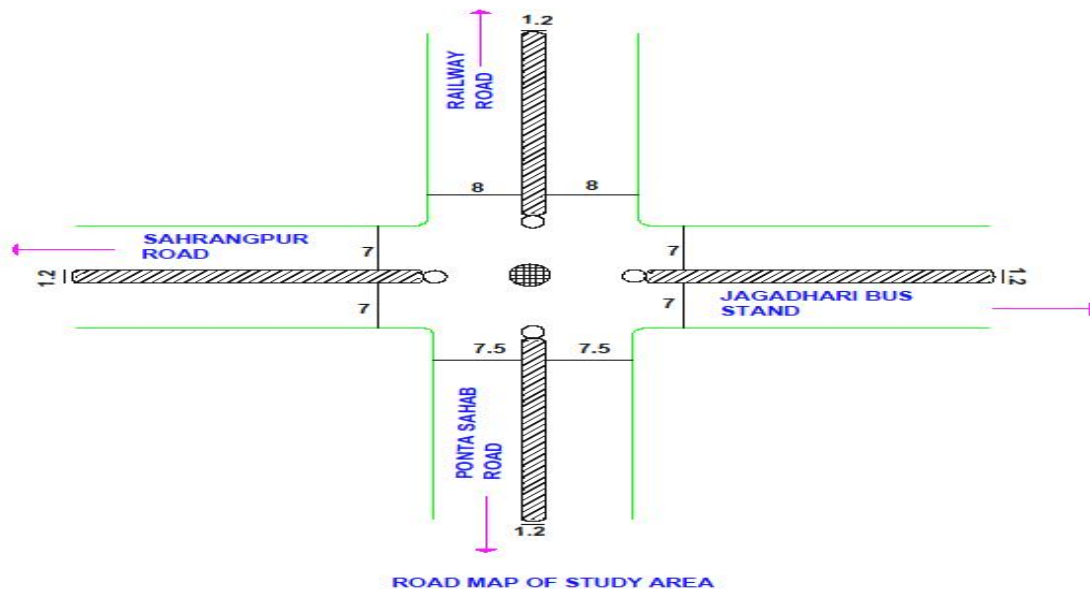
Road Plan of Intersection at Site (NH-907)
